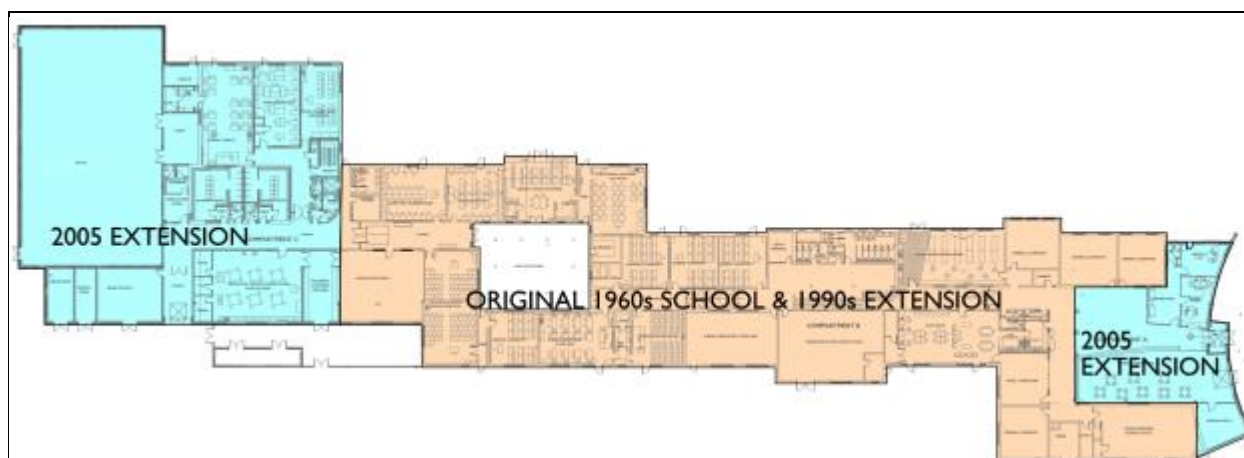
Coláiste Mhuire Askeaton Ground Floor Plan (NTS)
